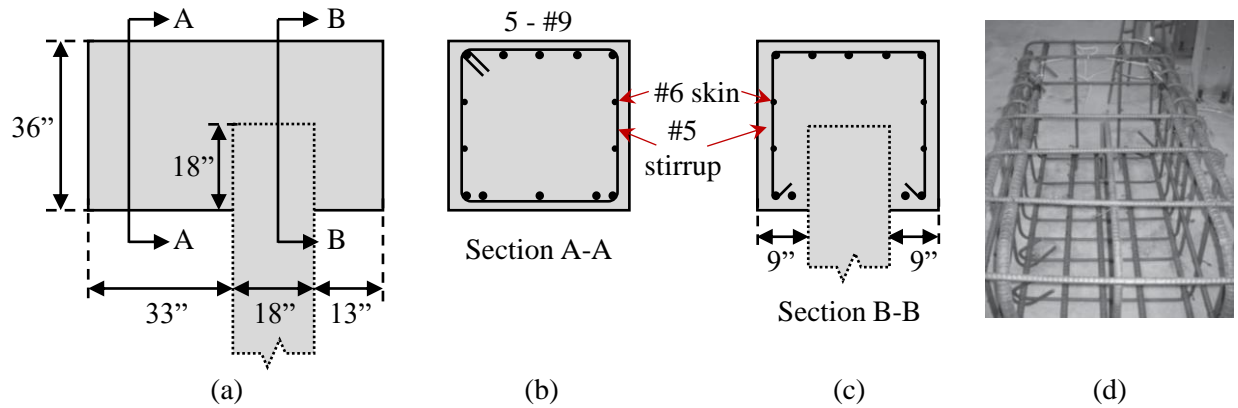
Typical pile cap reinforcement from Larosche et al. [15]
